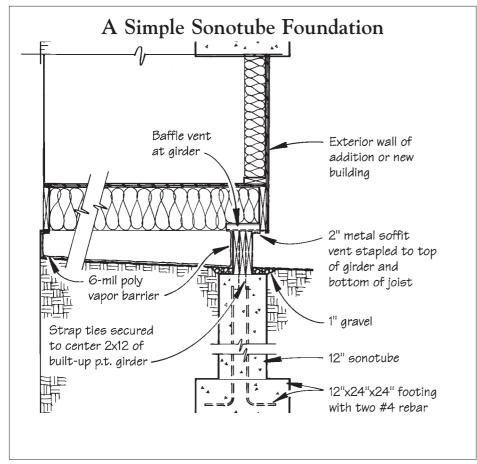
Pier foundations work well for garages, pole barns, and even small home additions. This foundation detail provides good insulation and ventilation, and doesn't disturb existing utility lines.
